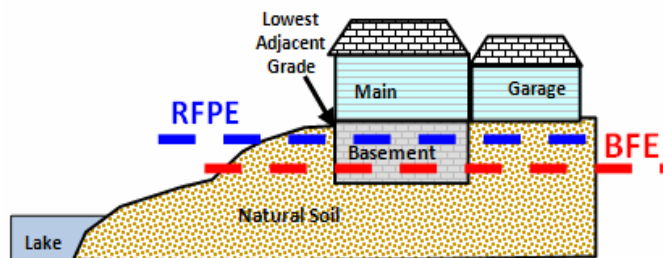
Lowest Adjacent Grade is above Base Flood Elevation (BFE) or the 1% annual chance flood elevation, so site is not in Zone A or AE. Minimum floodplain regulations do not apply. NOTE: The community may have higher standards. For example, if the site is in shoreland district, there are still minimum elevations.
